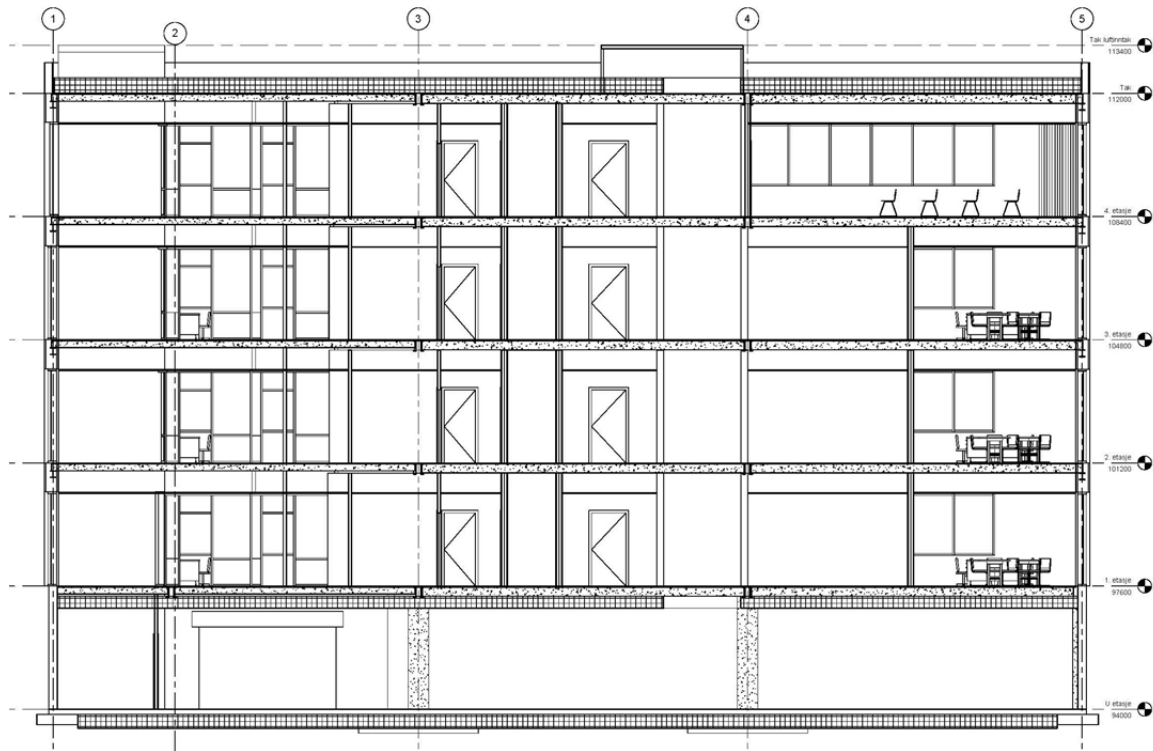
Section along east-west axis showing a traditional load-bearing structure of concrete slabs supported by steel beams and columns resting on a reinforced concrete foundation.
